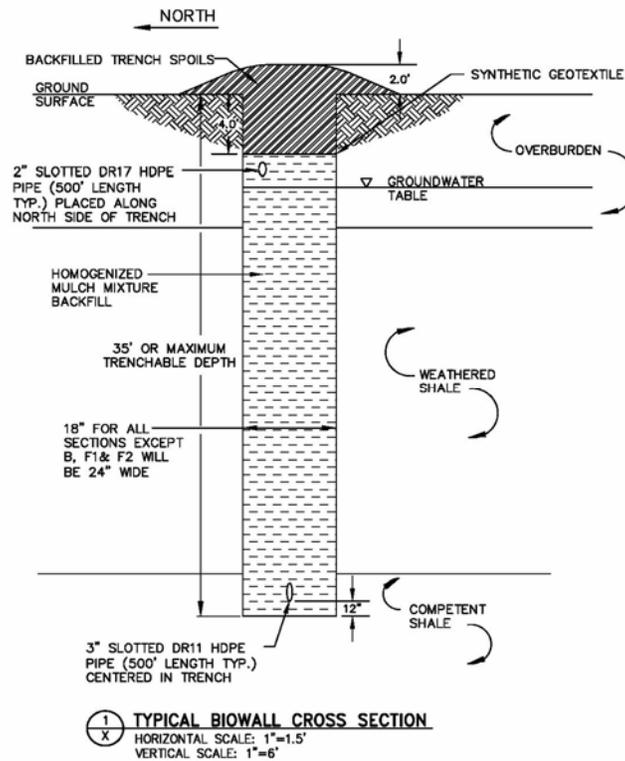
Construction Diagram of Typical Biowall Cross Section
